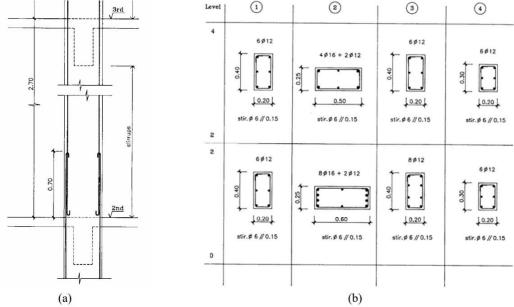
Reinforcement details the tested frame [4]. (a) lap-splicing detail; (b) cross-section characteristics.
